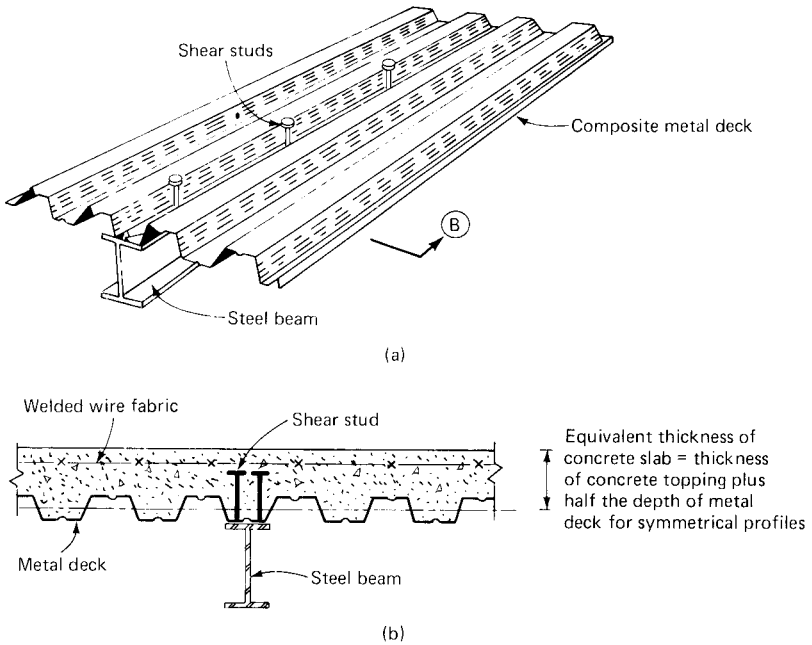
Composite beams with formed deck parallel to beam. (a) Schematic view; (b) section B showing equivalent thickness of slab.
